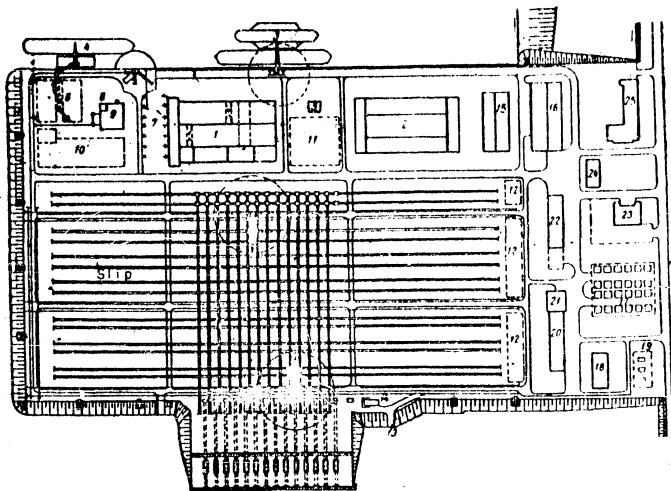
General plan of a ship-repair installation on a peninsula. 1, section block: mechanical, electrical-repair, mechanical-repair, and tool; 2, section block: hull-and boiler, pipeline, electroplating, forge, transformer substation, and compressor station; 3, mooring line for finishing work; 4, floating crane; 5, oxygen station; 6, coal warehouse; 7, steel warehouse; 8, pumping station; 9, boiler room; 10, 11, 12, outdoor work areas; 13, pierce furnace; 14, control panel and transformer substation; 15, woodworking section; 16, central warehouse; 17, warehouse for green lumber; 18, warehouse for dry lumber; 19, warehouse for liquid fuel; 20, garage; 21, electric-truck depot; 22, naval-stores warehouse; 23, firefighting station; 24, passage; 25, installation administration and dining hall.
